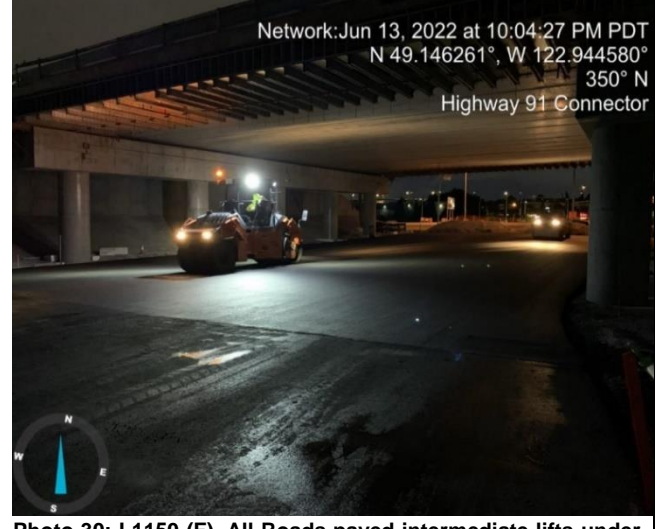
L1150 (F). All Roads paved intermediate lifts under S3 bridge
